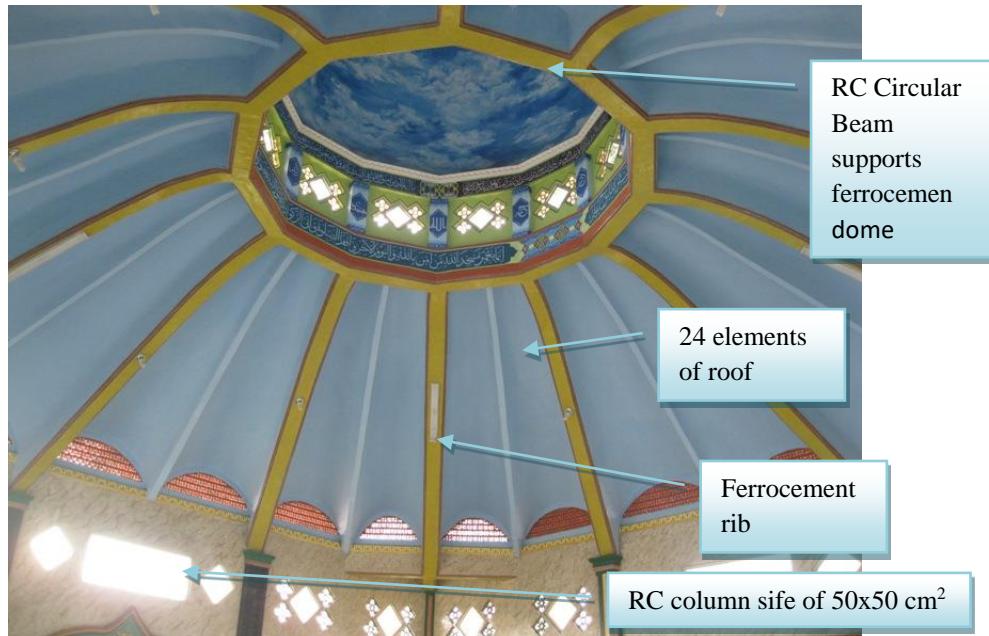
Ferrocement wave roof consists of 24 elements which supported by 12 oblique-angled RC beams.
